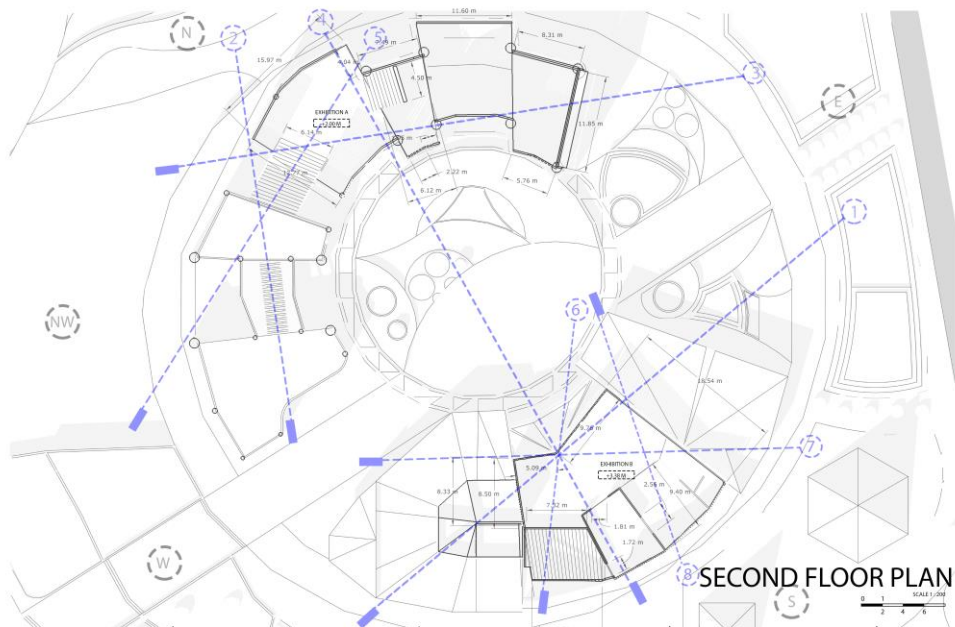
Second Floor Plan (Source: author analysis)
